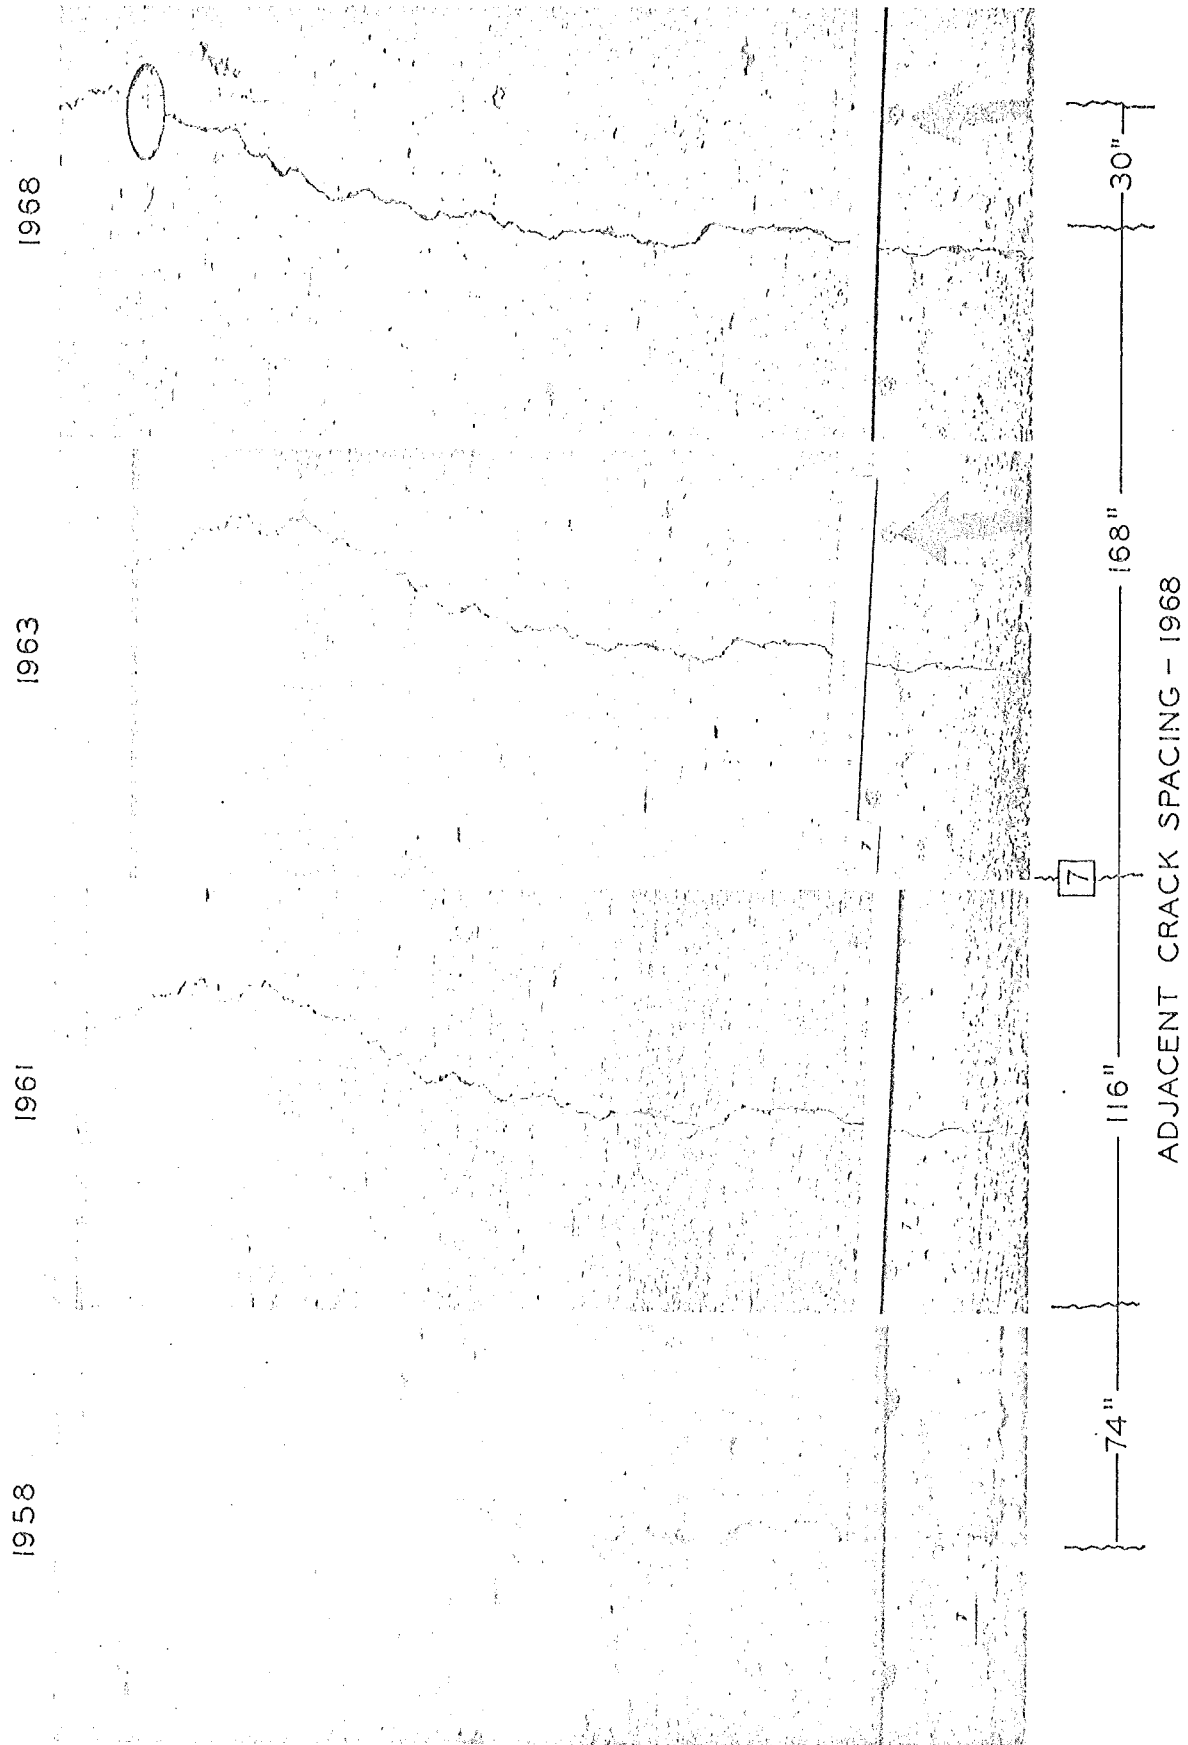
Transverse crack in bar mat section in the center of a day's pour.
